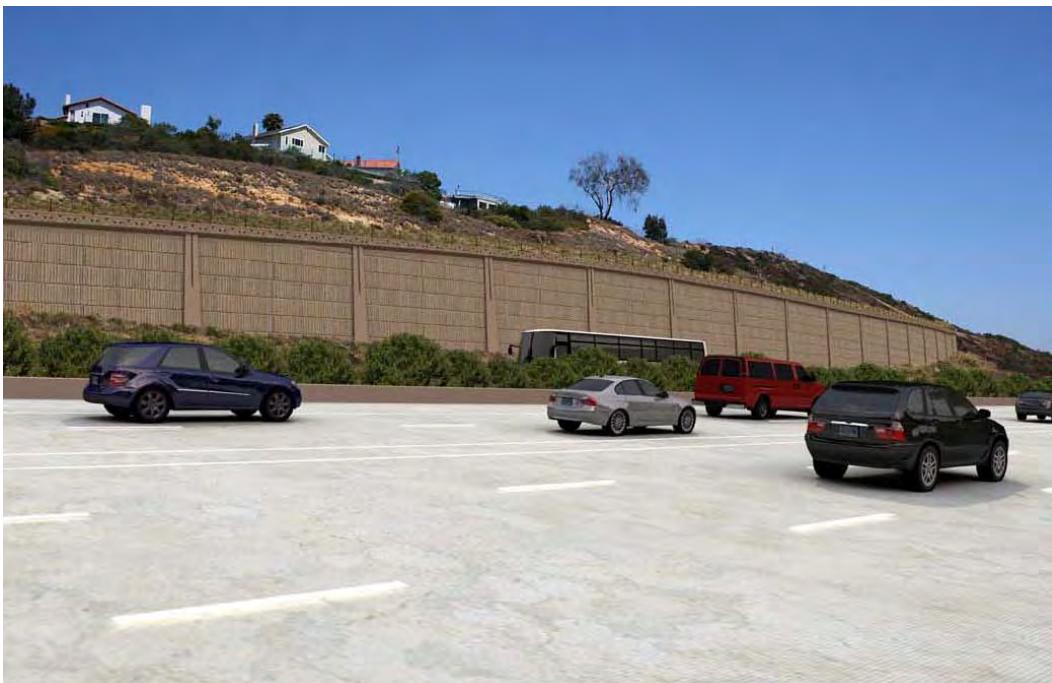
Looking north along I-5: Proposed view north of Del Mar Heights Road with retaining wall and wider roadway
